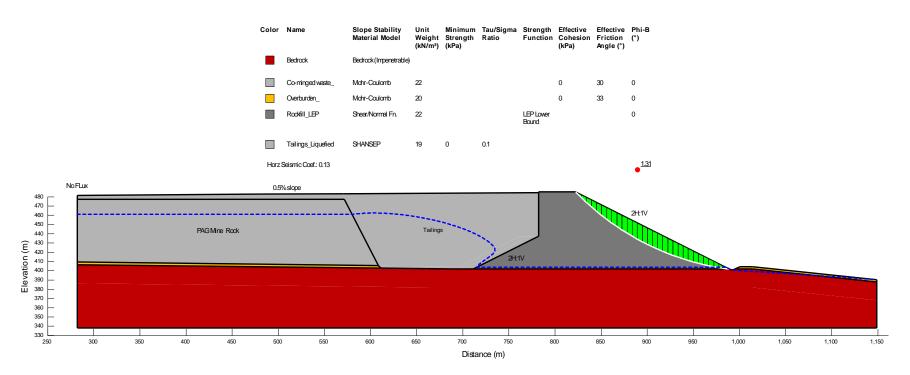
CDF North Cell Perimeter Dam, Typical Section – Stability Analysis of Design Earthquake Loading (Pseudo-static) Condition
